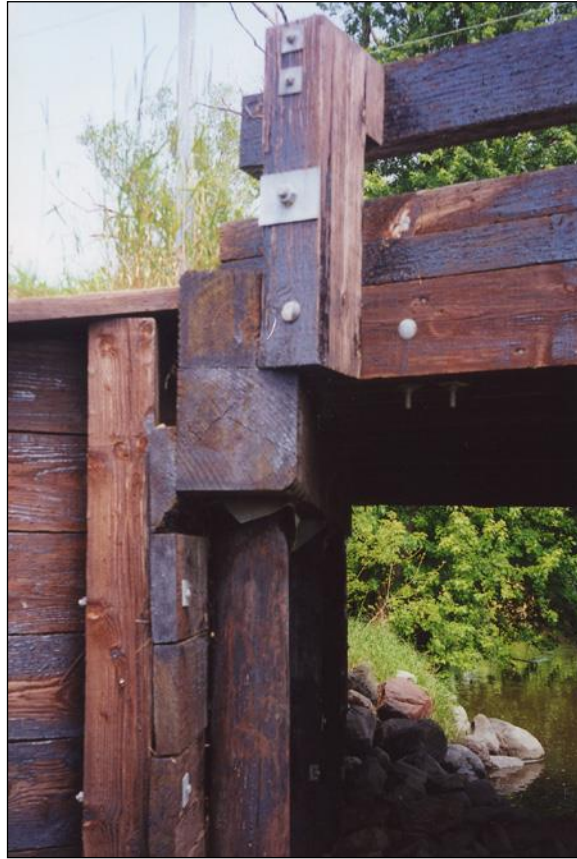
Timber Pier Cap and Abutment - Condition State 1
